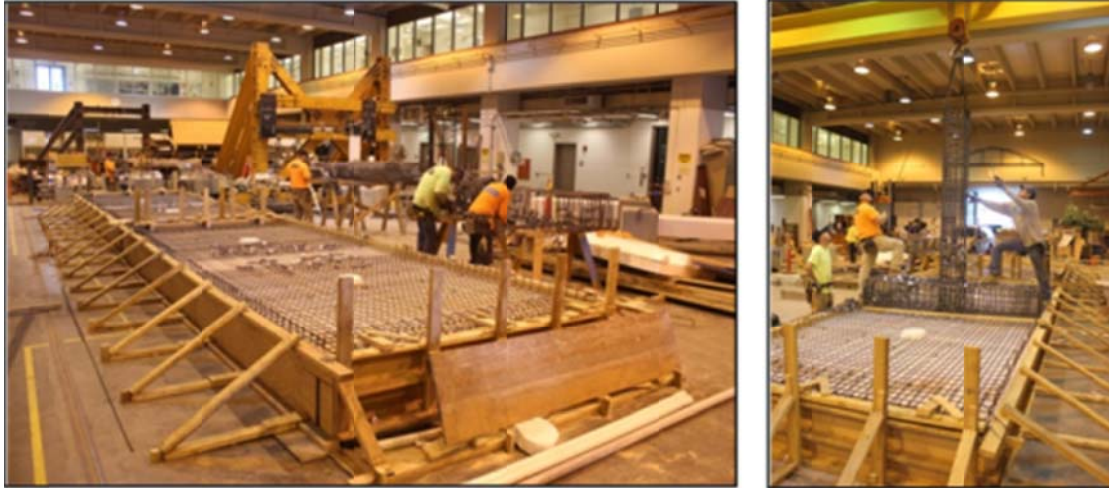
Reinforcement steel mesh for the deck slab (left) and fabrication and setting up of the column and cap beam steel cages (right)
